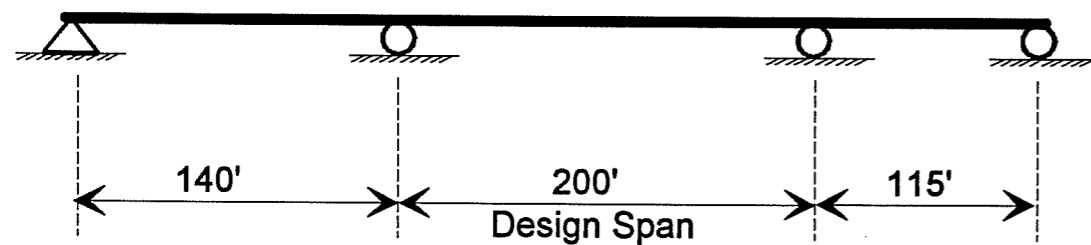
Layout of actual bridge modeled in Design Example #3.
